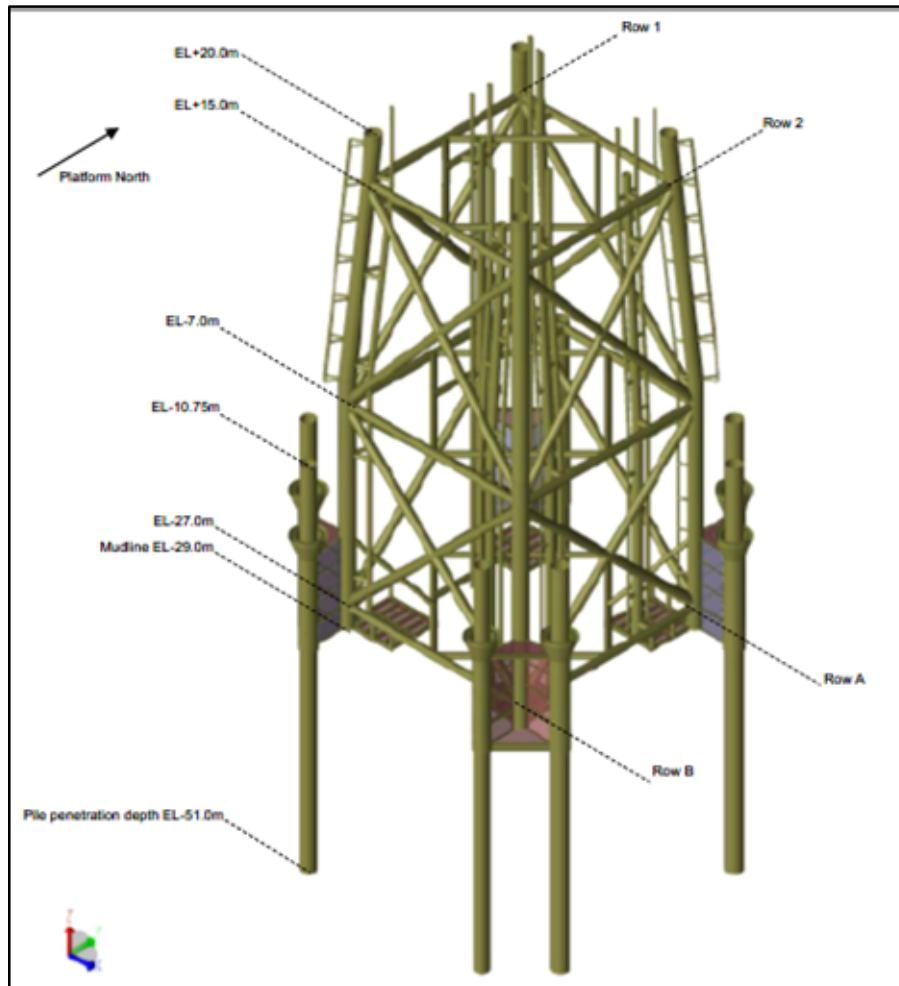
New Douglas Jacket with 8 sleeve Pile Arrangement (Overview)
